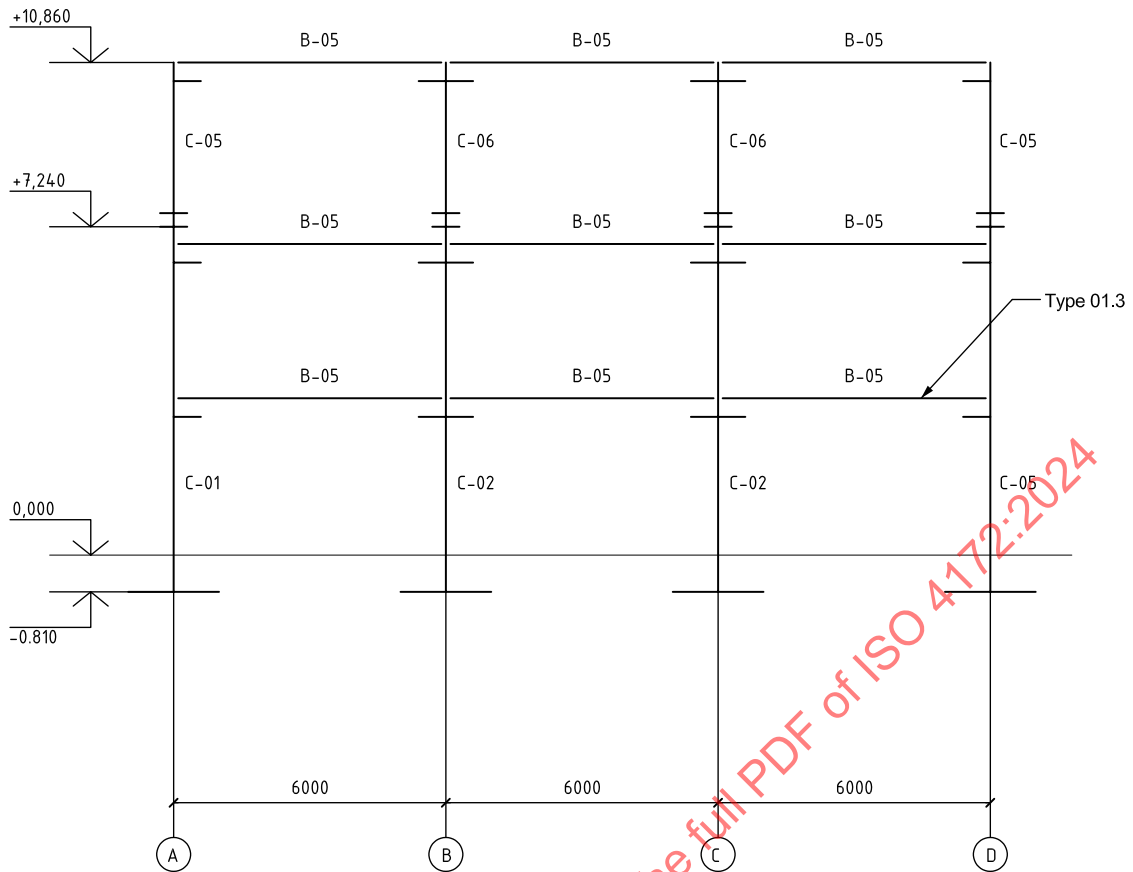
Example of a general arrangement drawing in which a structural frame is indicated in section view
